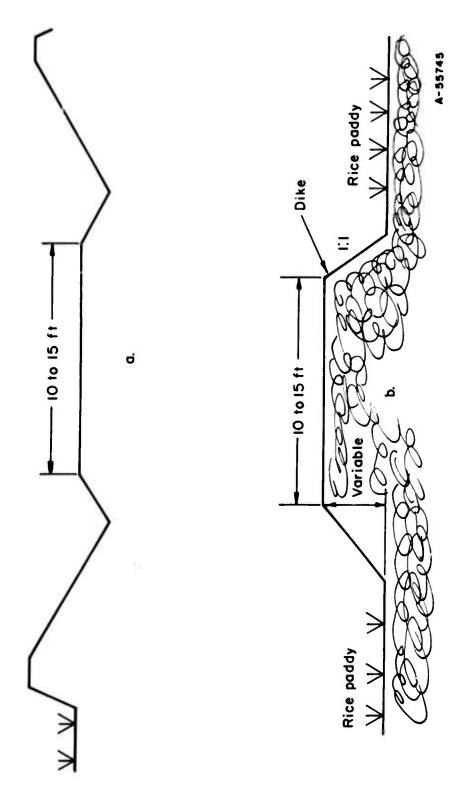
MINIMAL ROAD CROSS SECTIONS WHERE FILL OR CHANNEL CONSTRUCTION IS REQUIRED
